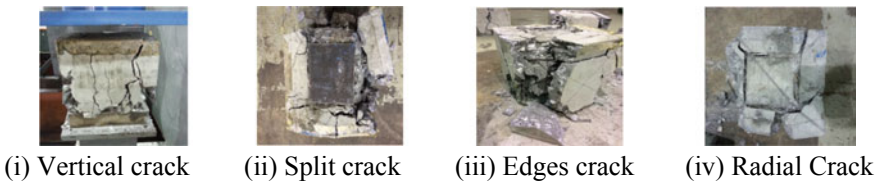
Modes of failures for reinforced concrete blocks concentrically loaded through 100 mm × 100 mm square steel plates
